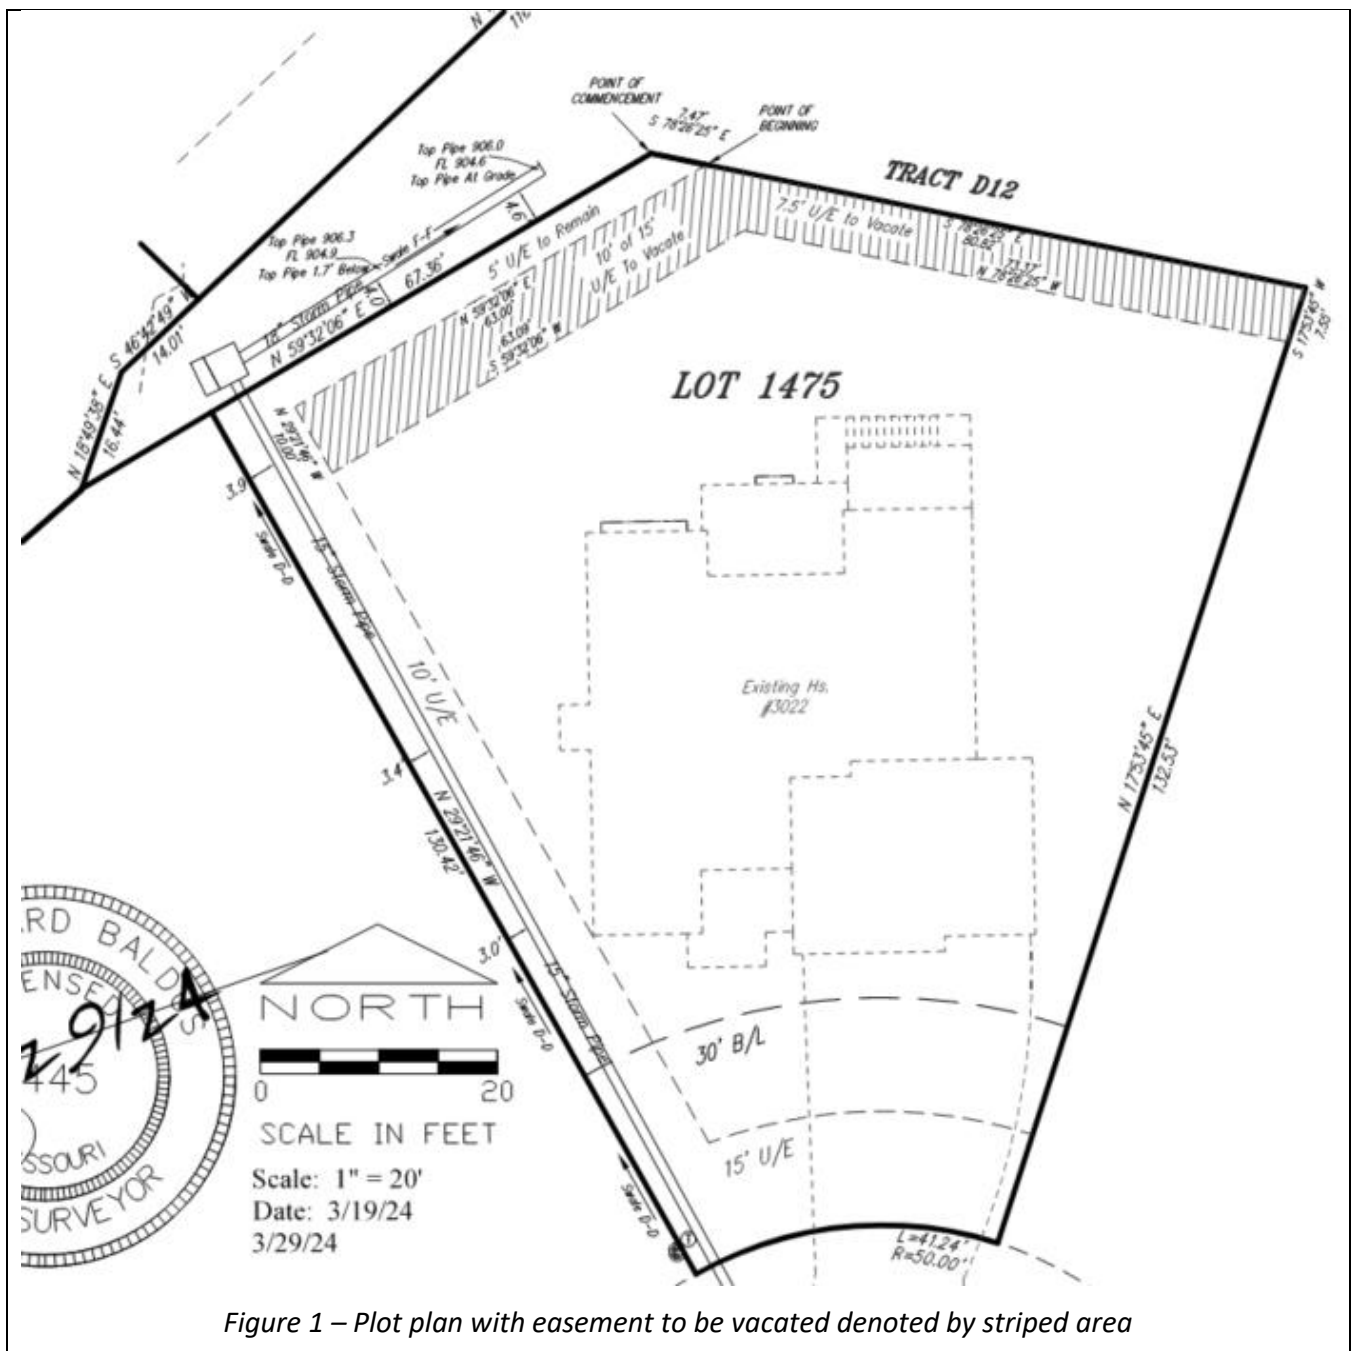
Plot plan with easement to be vacated denoted by striped area
